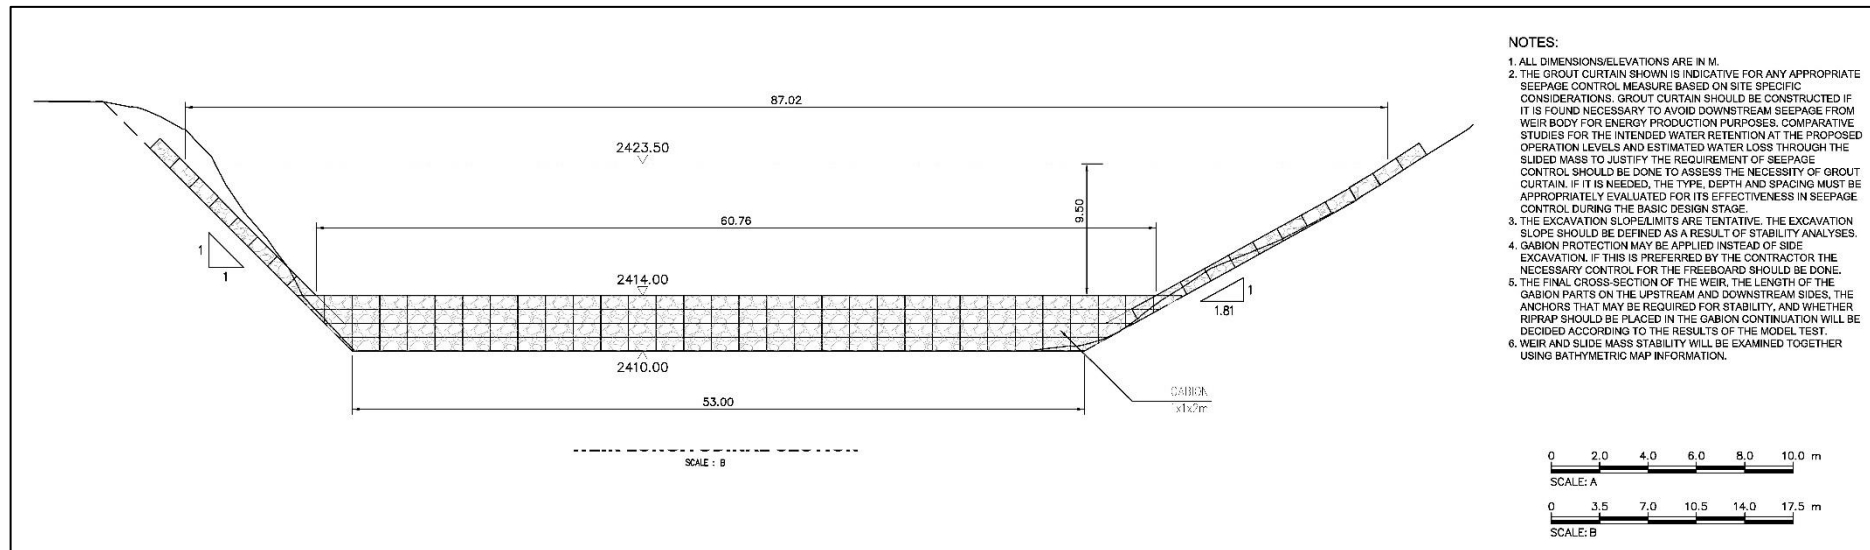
Proposed Flexible/Rigid Overflow Structure Cross Section
